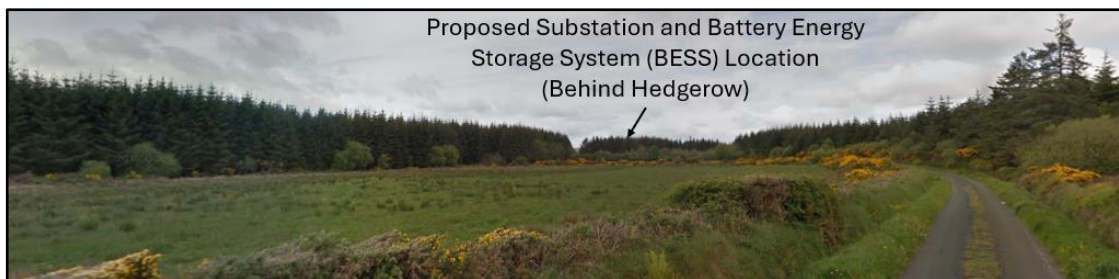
View of the proposed onsite 38kV substation from the East.
